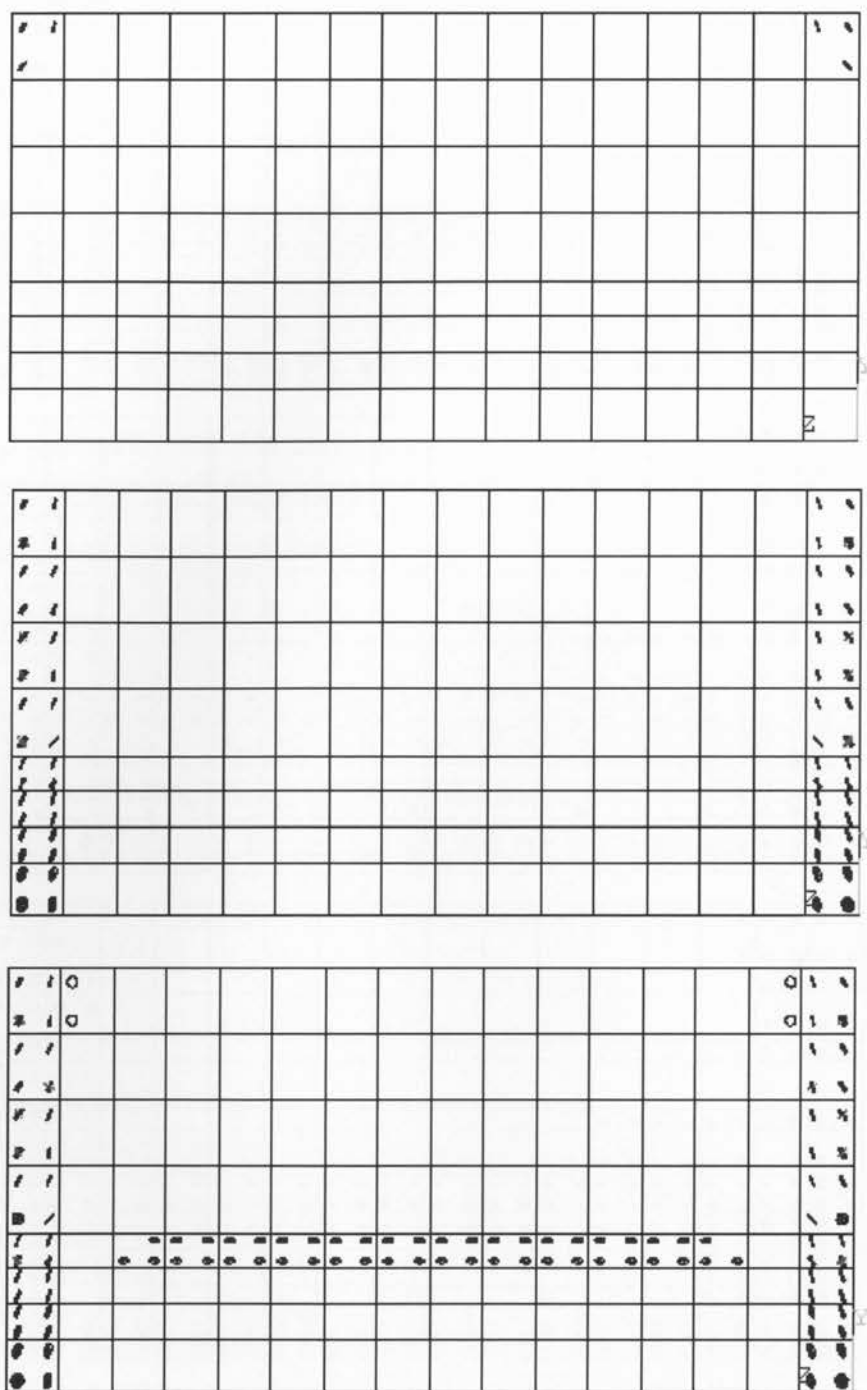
Crack patterns of 2m barrier wall (fix – fix) @ 10, 100 & 500 hours
